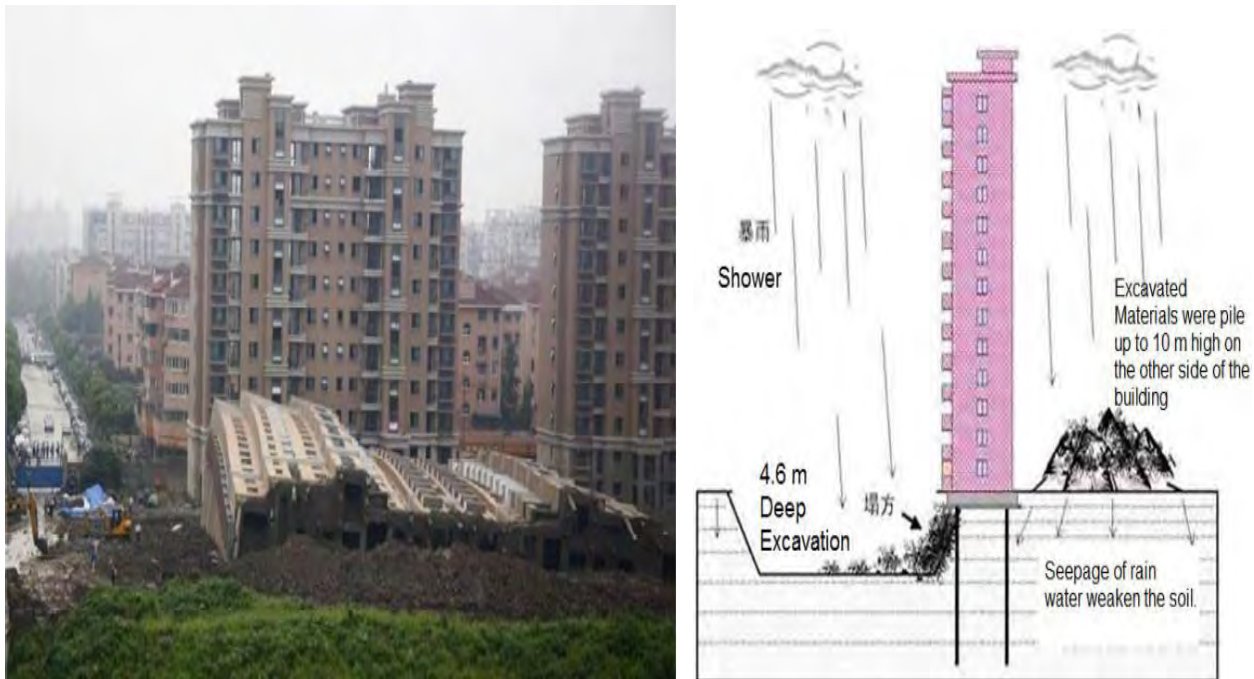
Ignorance of Open cut excavation led to a building collapse – China [9]
